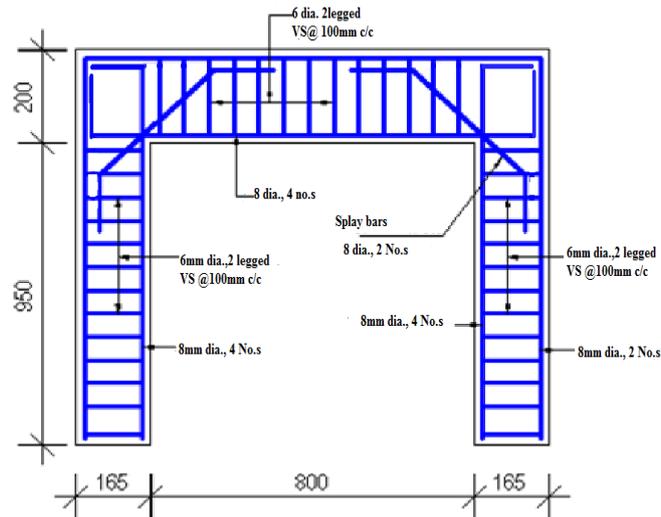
Inverted L- type detailing arrangement with splay steel (SP3)
